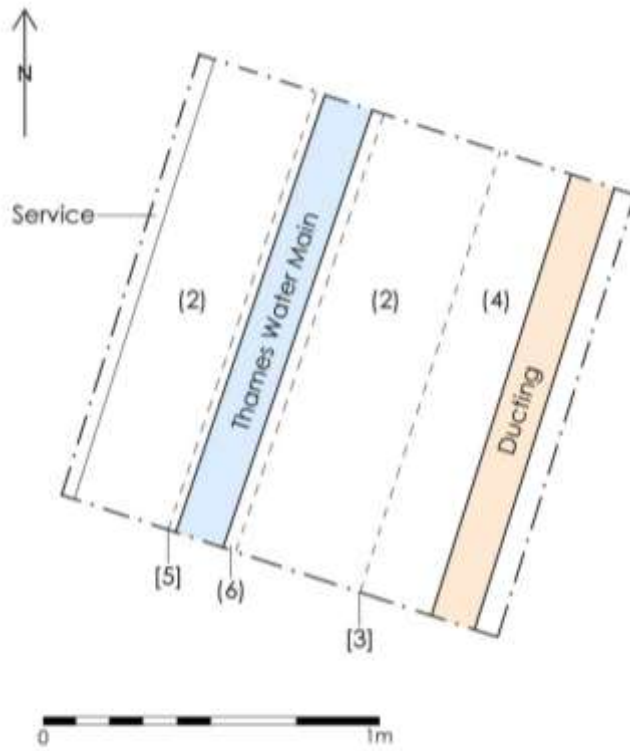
Plan of tree pit 1. Original drawn at 1:20.
